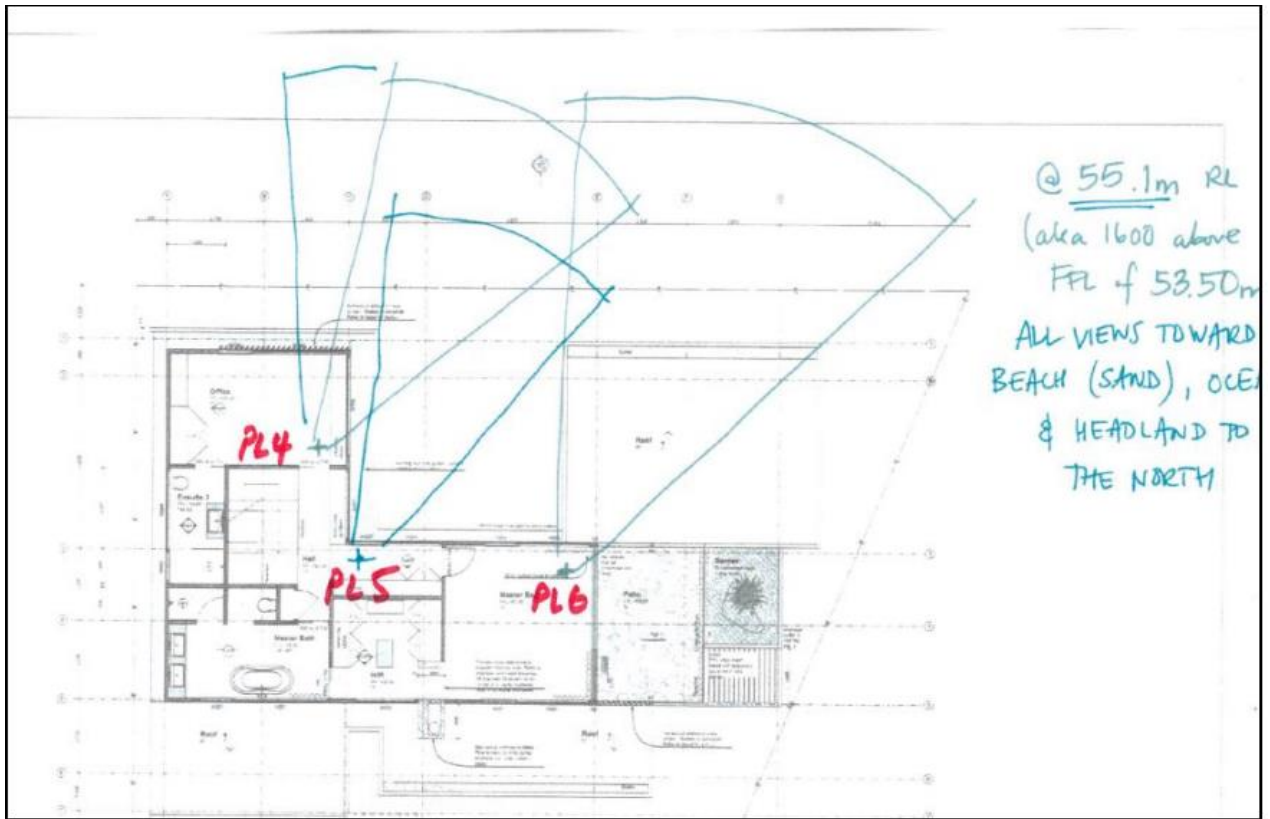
Diagram showing positions and RL's for photographs taken from future 1st floor level of dwelling house under construction (Courtesy Poppy Bevan Architect)
